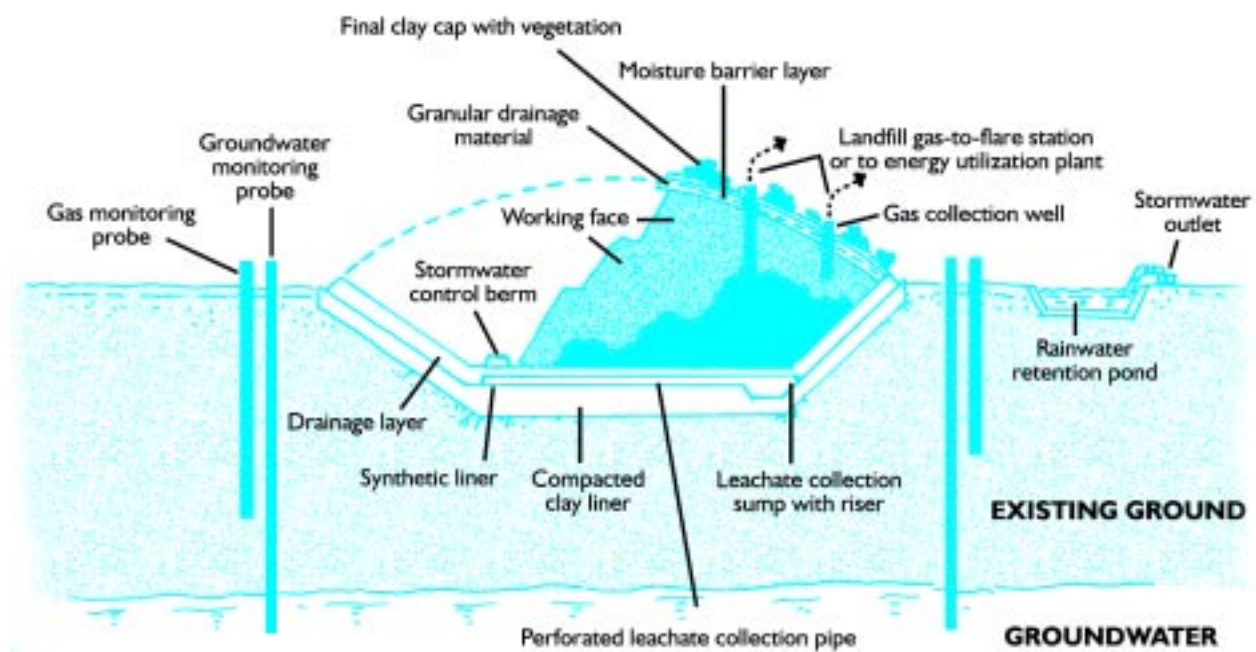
Cross-section of a typical modern sanitary landfill (adapted from Portney and Stavins 2000).
